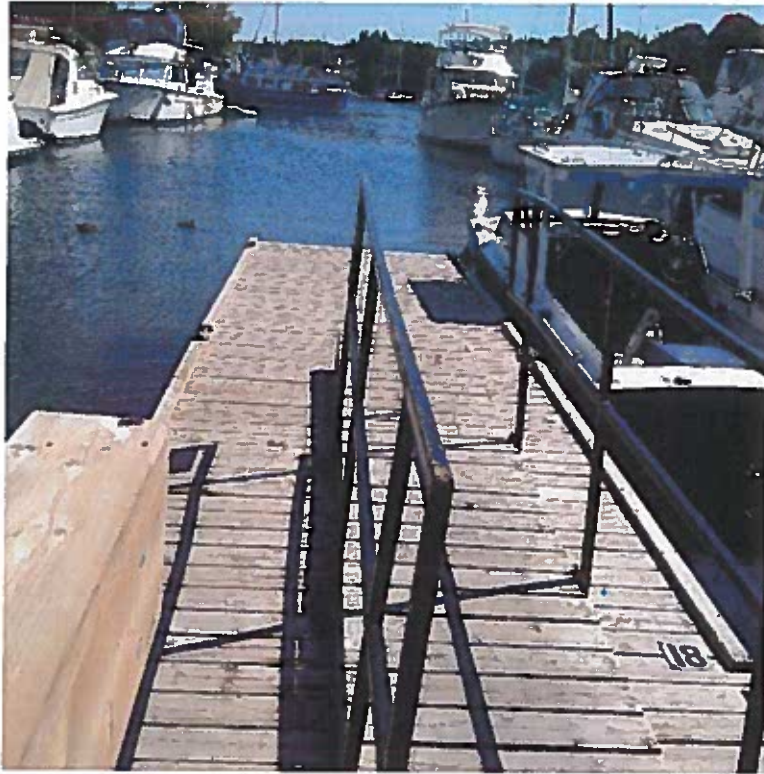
Small Dock to the South of Boat Launch, Looking East from West Wall
